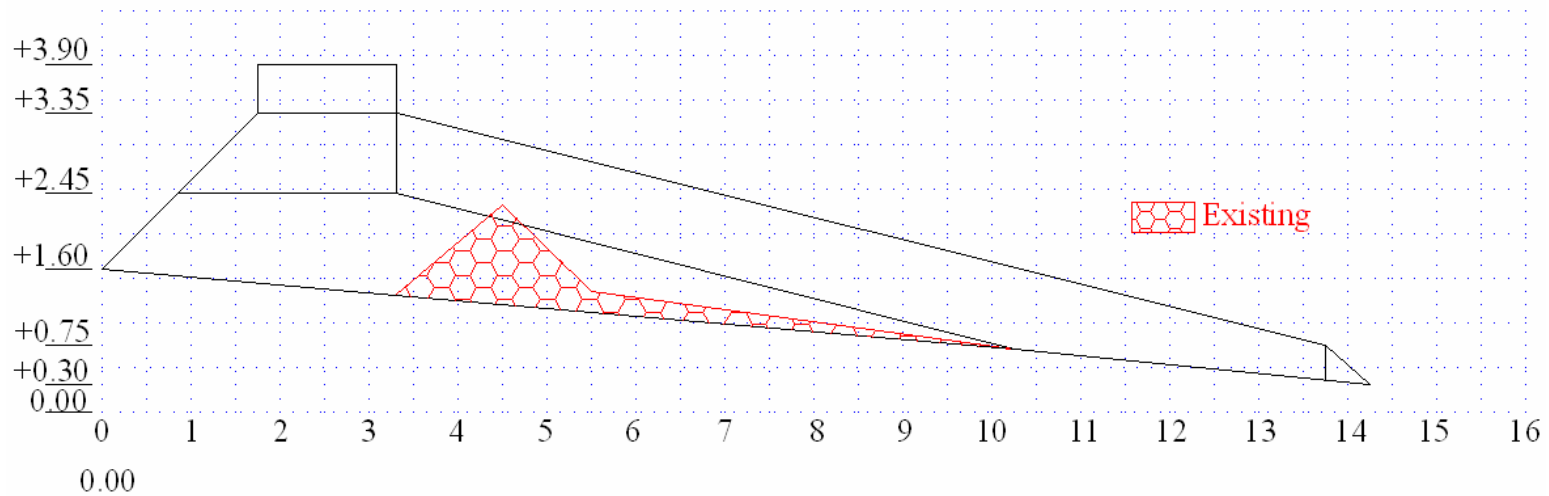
Existing and Proposed cross-section in Perinjilam
